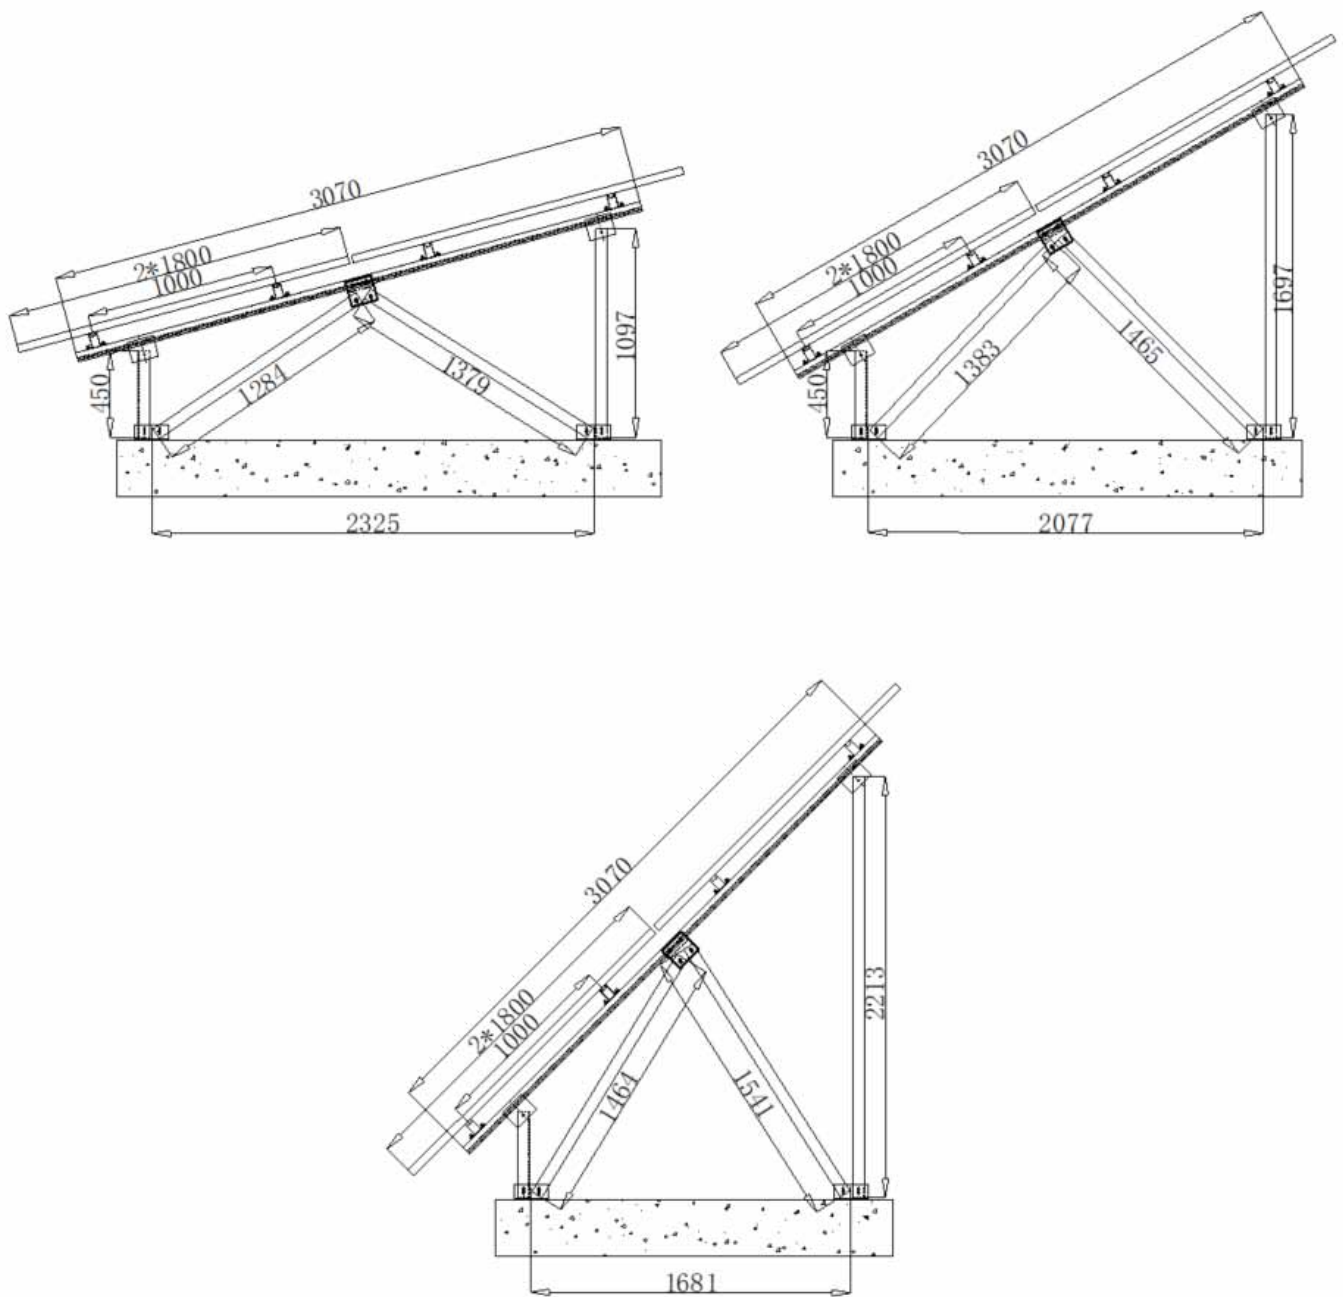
PV Panel 1800x1100mm with Concrete Footing Details
